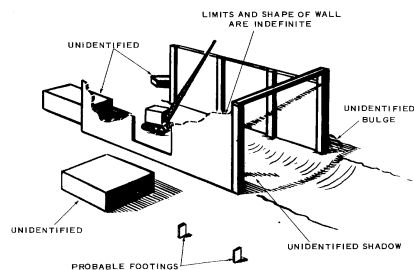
PERSPECTIVE VIEW OF RIGHT SUSPECT TERMINAL HOUSE UNDER CONSTRUCTION AT MISHELEVKA DUAL HEN HOUSE D.
